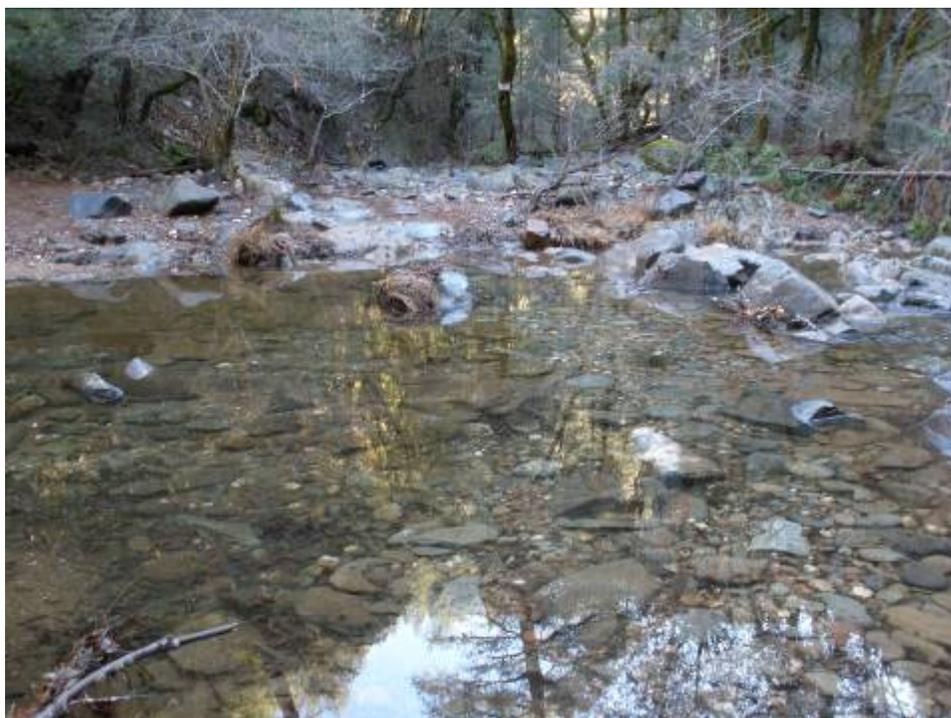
Lower Rock Creek Crossing to be replaced with a steel bridge.
